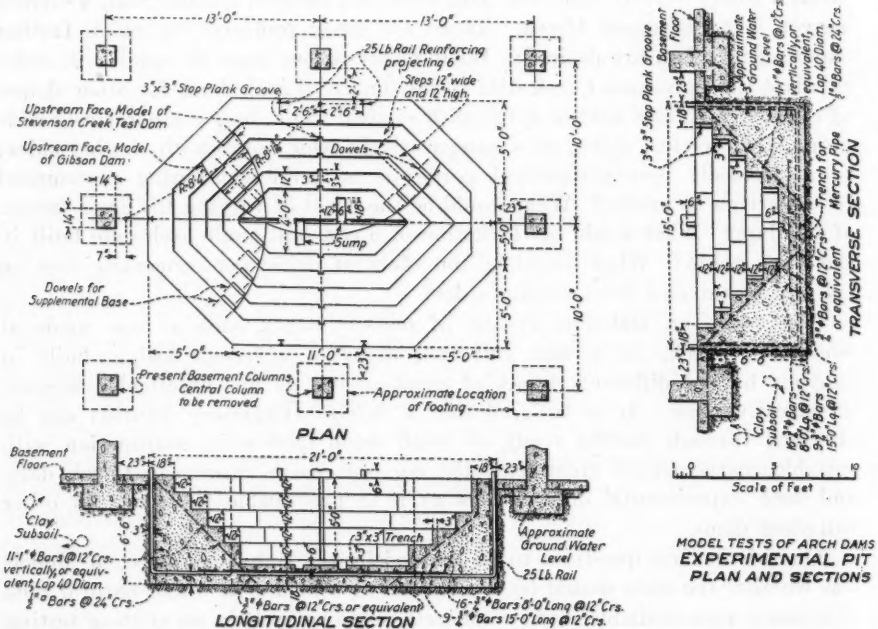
PLAN AND SECTIONS OF CONCRETE TESTING PIT, ENGINEERING TESTING LABORATORY, UNIVERSITY OF COLORADO.
